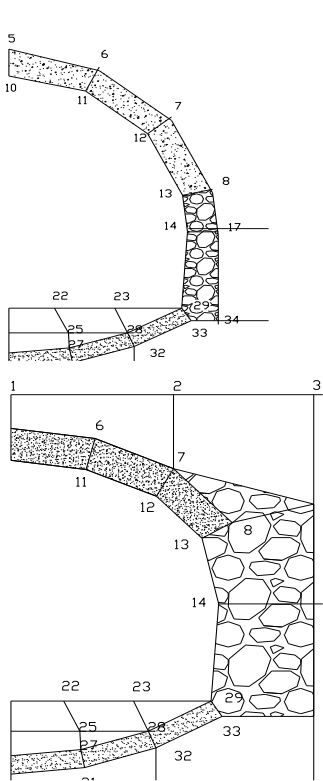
Mesh of the current tunnel and lowered (sections 9-15).
